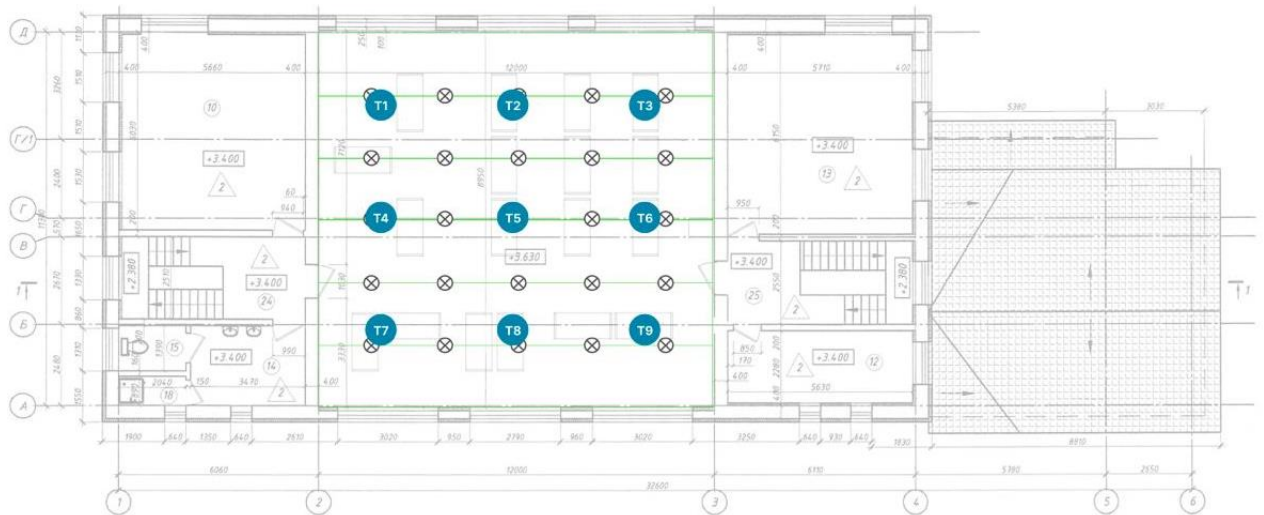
Layout of the lighting measurement points and location of the existing luminaires mounted to the metal roof trusses
